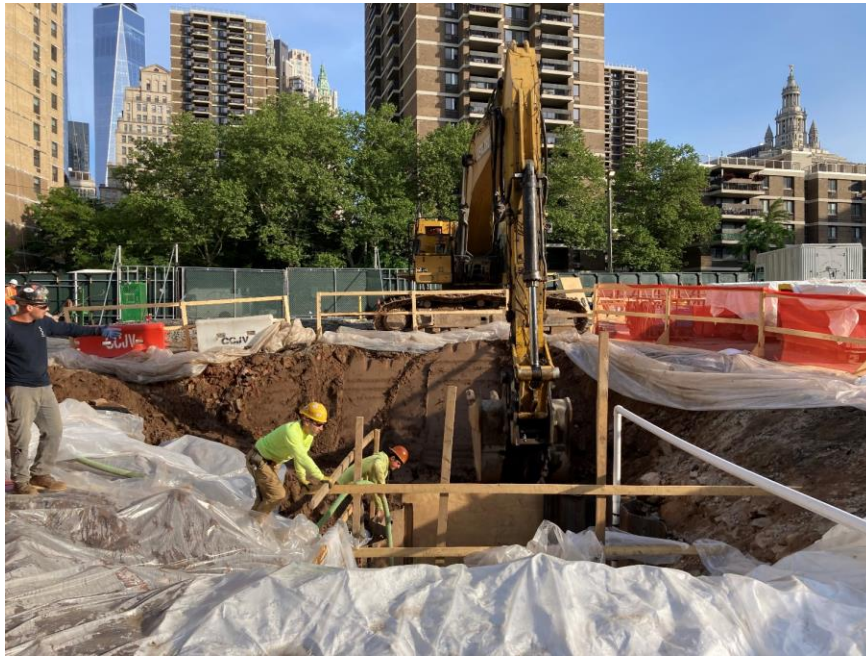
View CCJV excavating soil/fill between previously installed foundation piles in the southwestern portion of the site (facing north)
